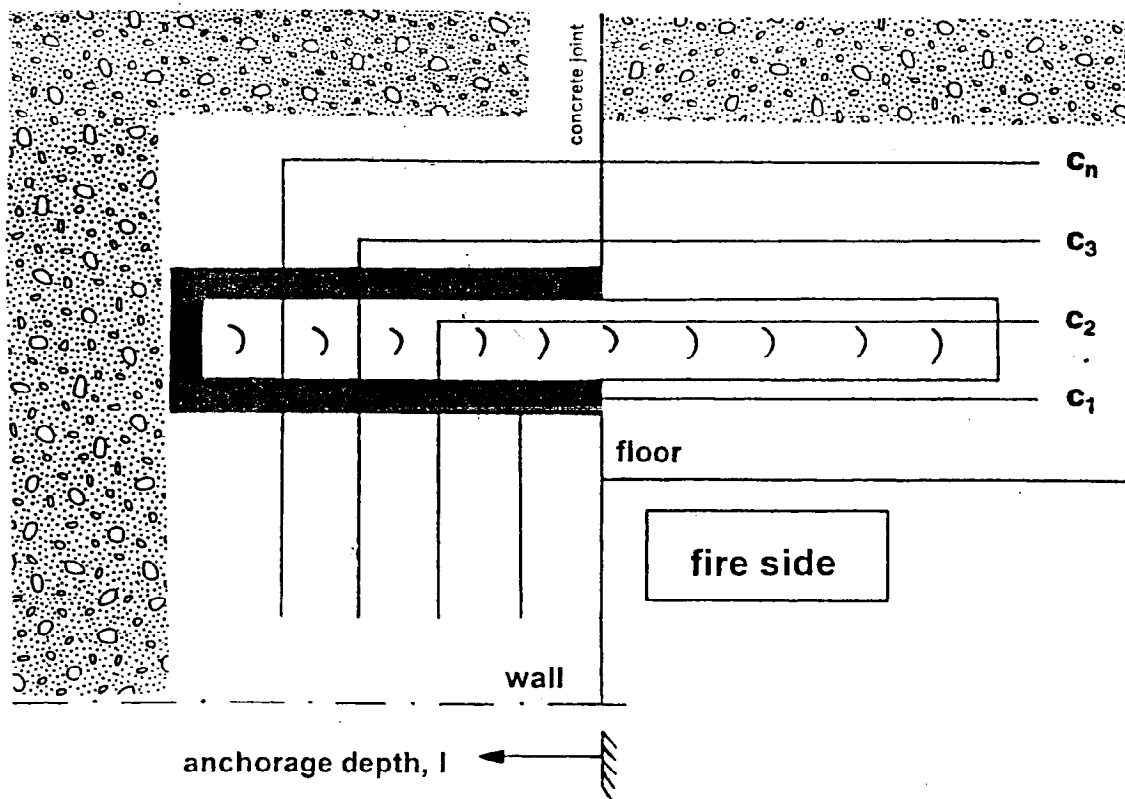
Schematic depiction of rebar connection version ANCHORING
